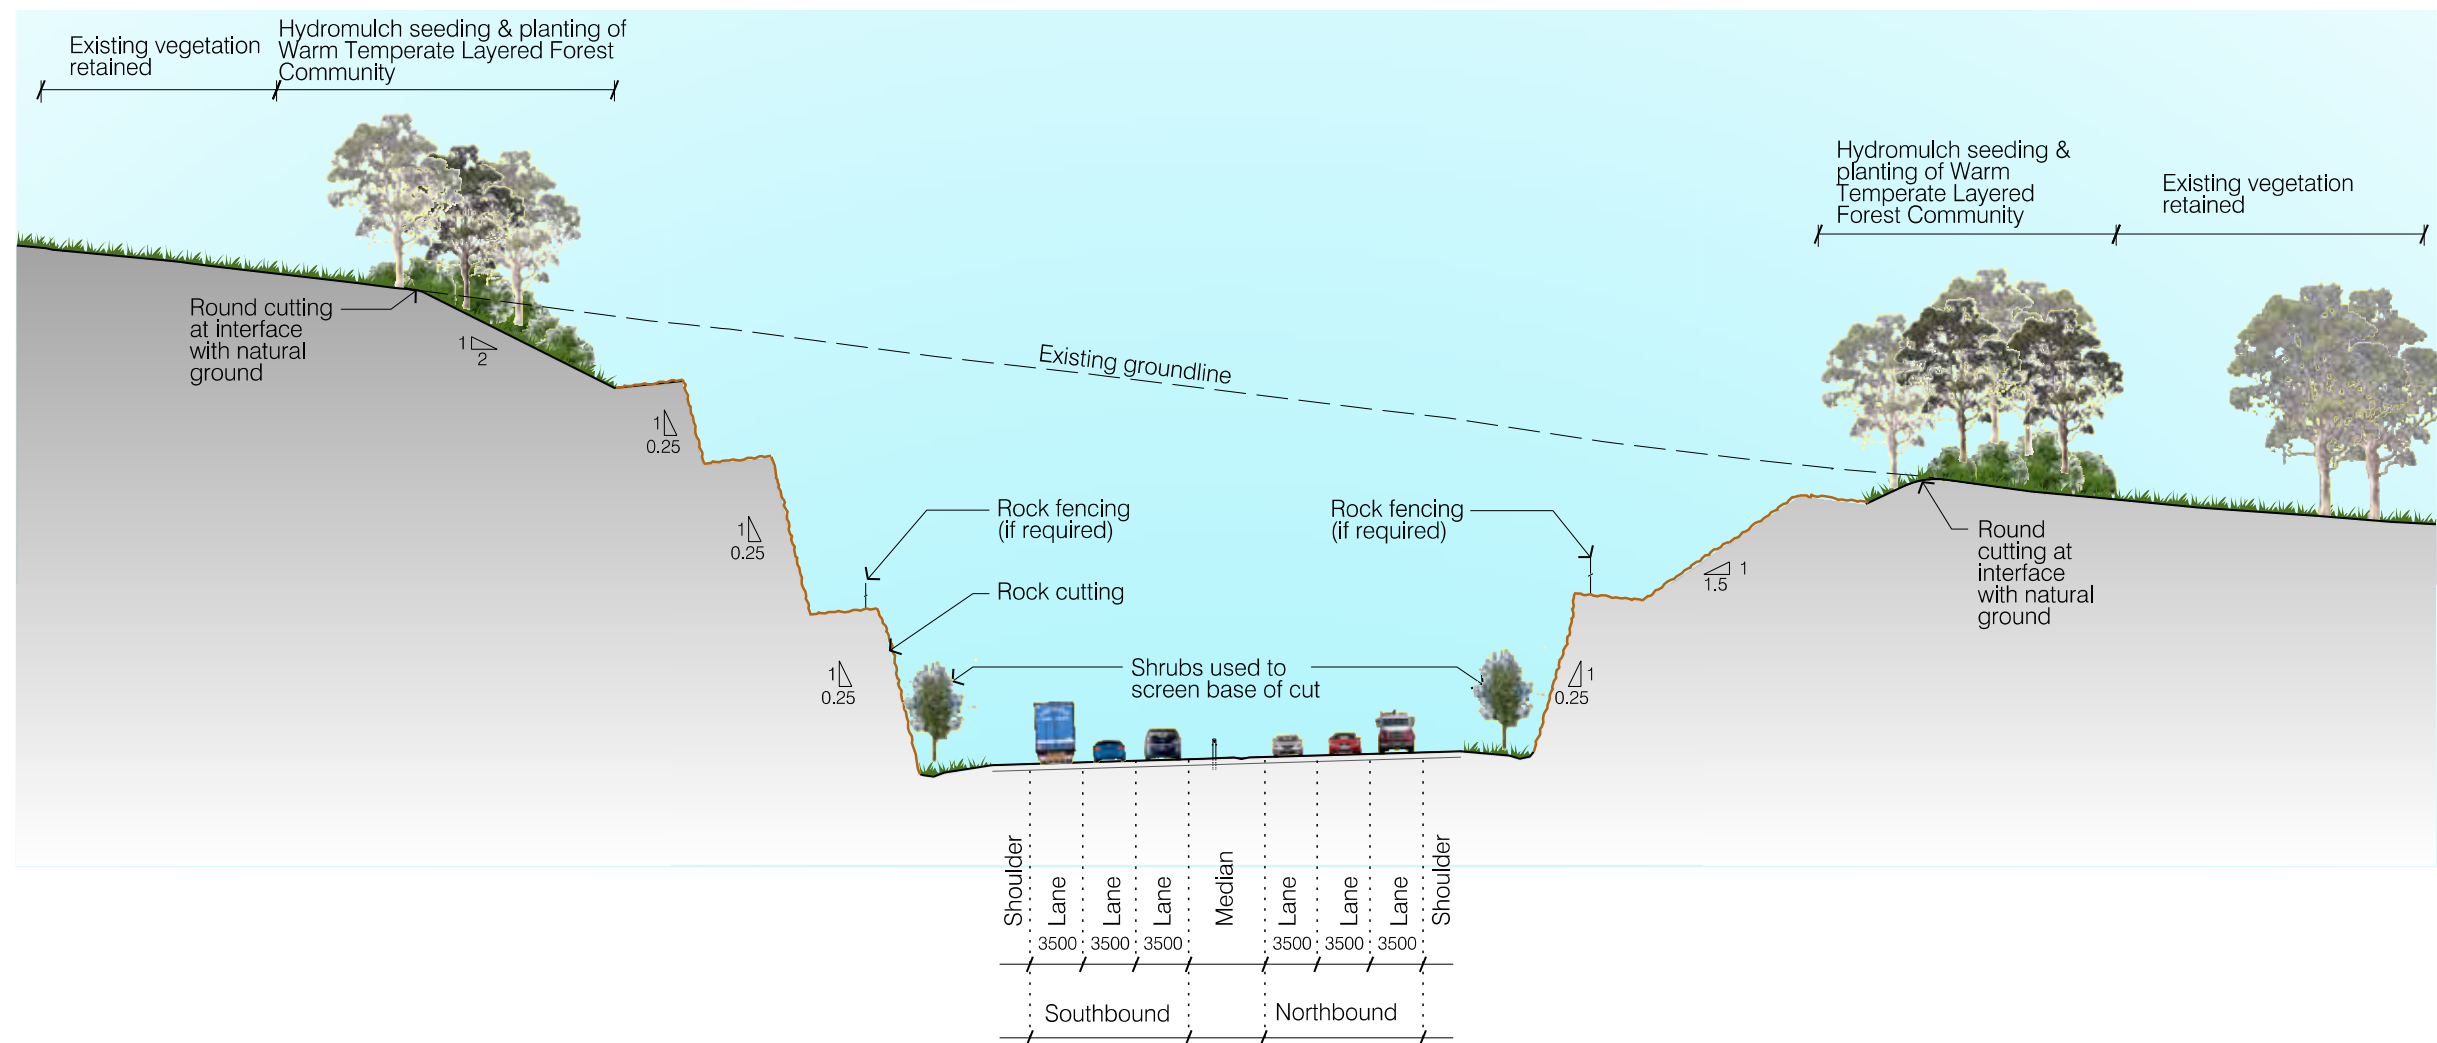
Road cross section at Ch. 8750 (Scale 1:500 @ A3)
